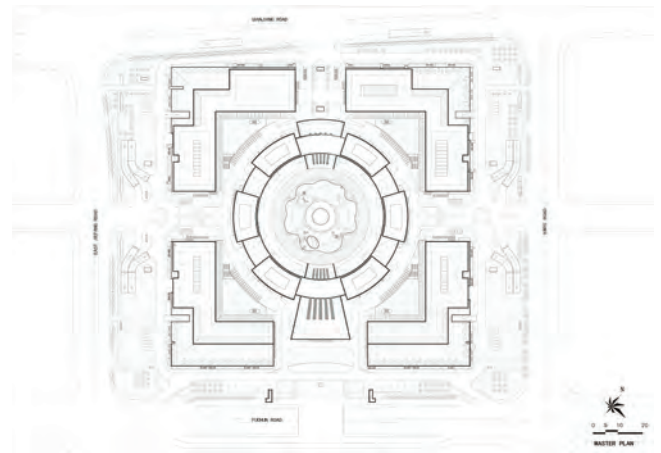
Master Plan of Hangzhou Civic Center (Source: Linxue Li)
